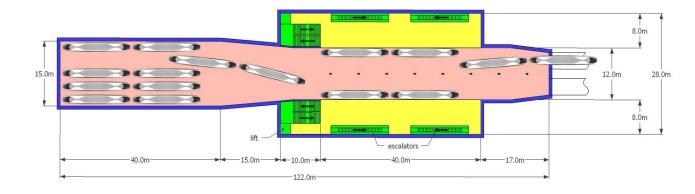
Cambridge Central Underground Station indicative plan layout
